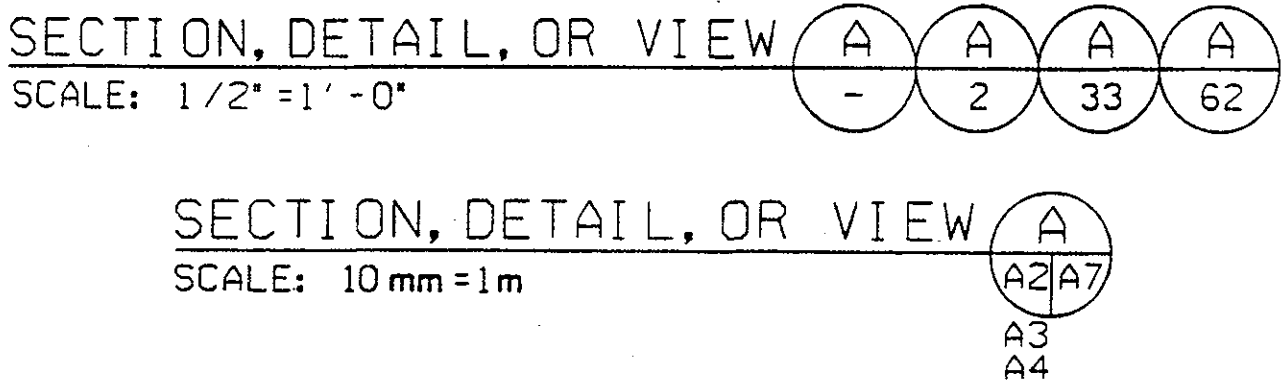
Examples of Section, Detail, or View Callouts Used in Multiple Places
